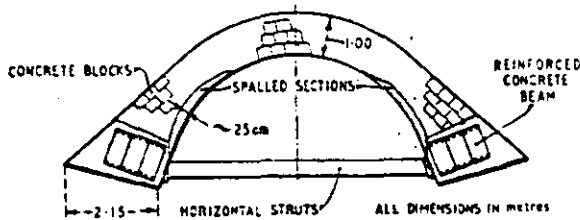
Roof-arch failure in a clayey-mylonite section of the new Semmering tunnel. The masonry consists of shaped concrete bricks, and high early-strength cement was used for these and for the reinforced-concrete beams.
